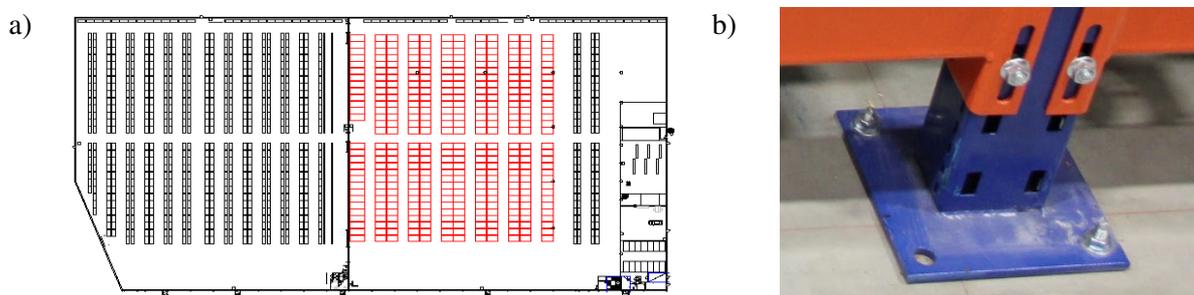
Typical warehouse racking layout (a) and racking baseplate (b)
